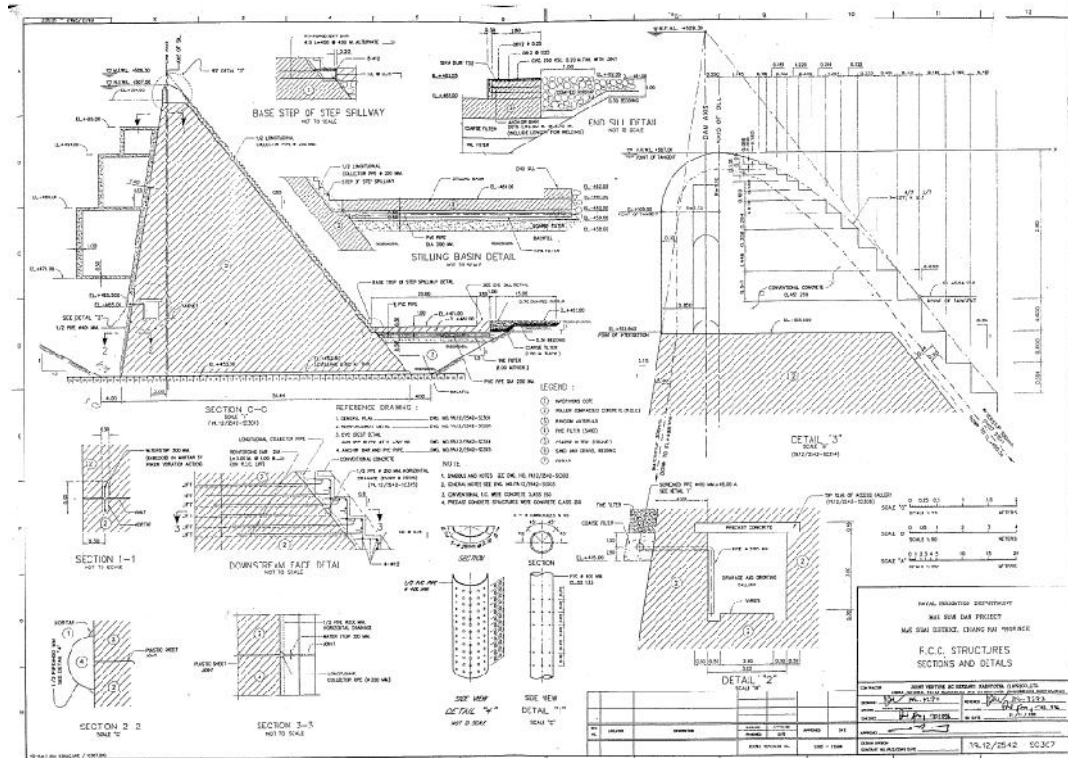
Schematic designed plan of stepped spillway at Mae Suay reservoir
